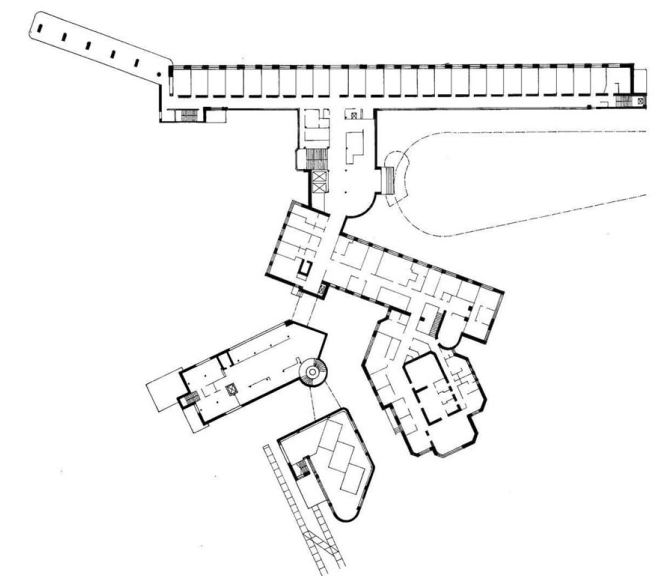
Floor plan Paimio Sanatorium. Source: Inexhibit, 2020
